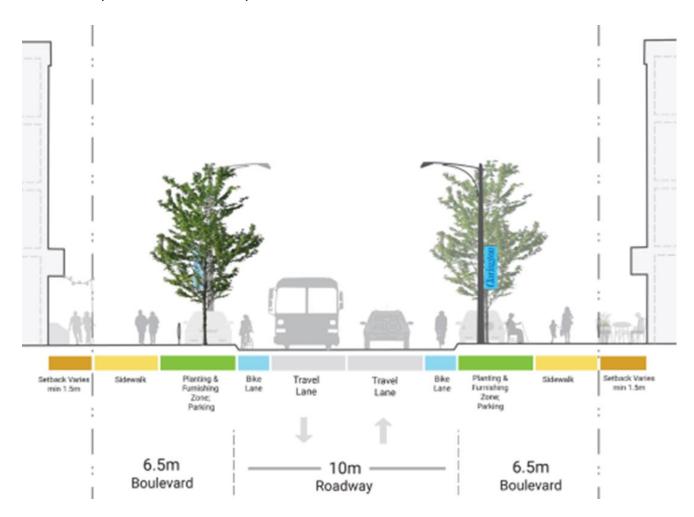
Proposed CWEP Waterfront Main Street Cross-Section (23 Metres)
